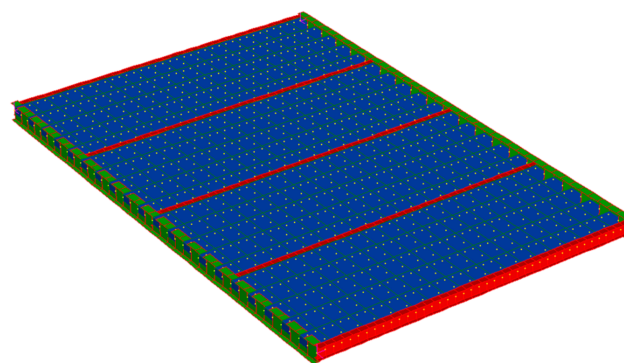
Meshed Composite Steel-Concrete Floor System.
